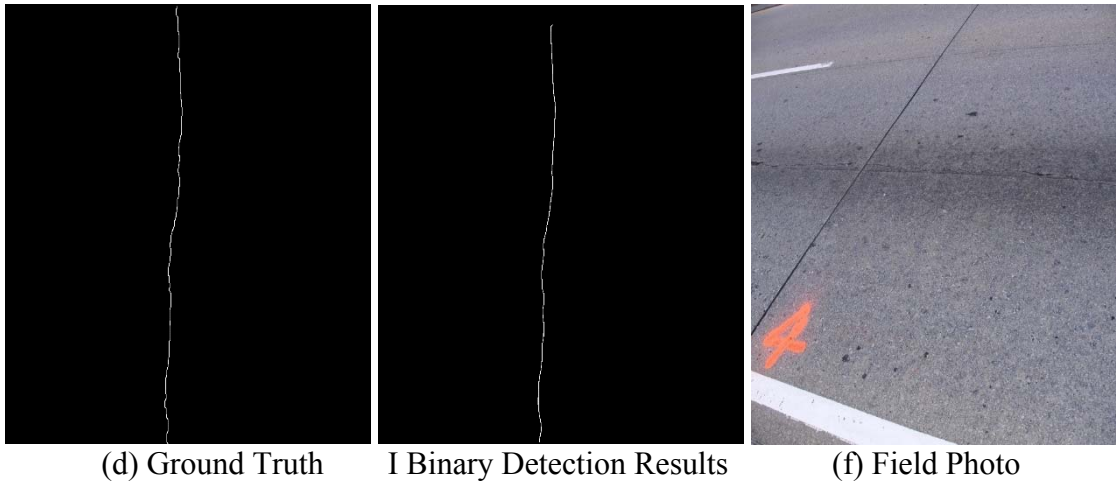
Crack detection on Slab #4 on I-516 test site (Score: 96.5859)
